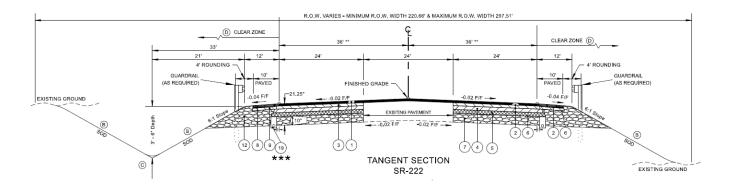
Typical Section 1 Source: Functional Plans (Dated 02/10/2023)
